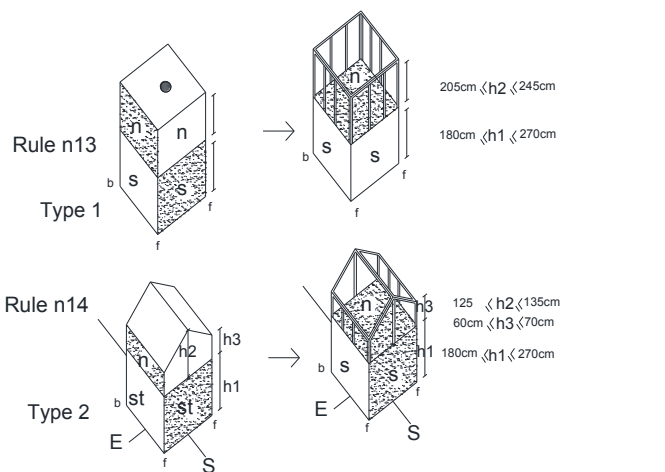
Rules for changing of the solid walls into columned walls in first floor of Nefar.
